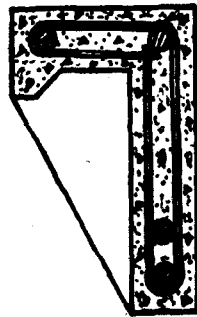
TYPICAL CROSS-SECTION OF 'L' PURLIN
